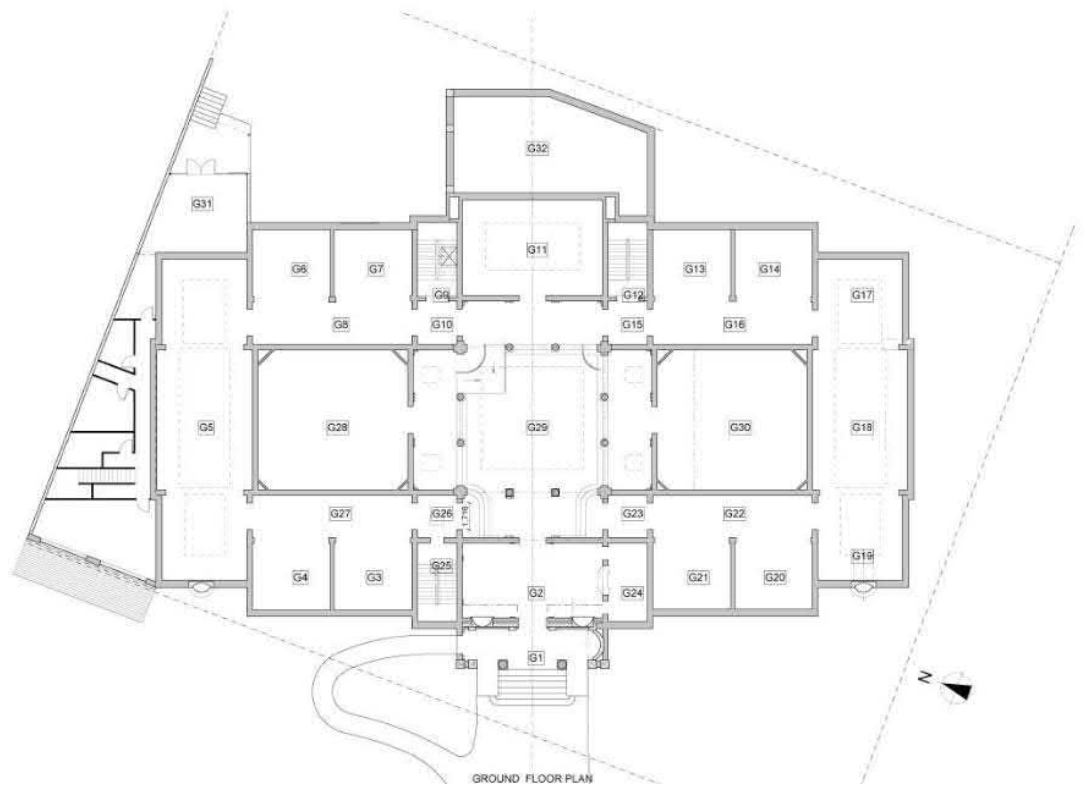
Robert McDougall Art Gallery Ground Floor Plan (Source: Conservation Plan, Dave Pearson Architects)
